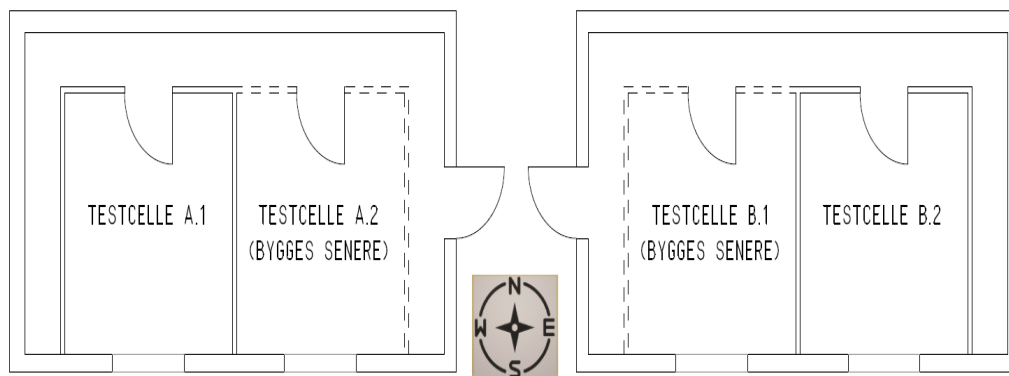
Relative position of Test room: Floor Plan of Module A and B
